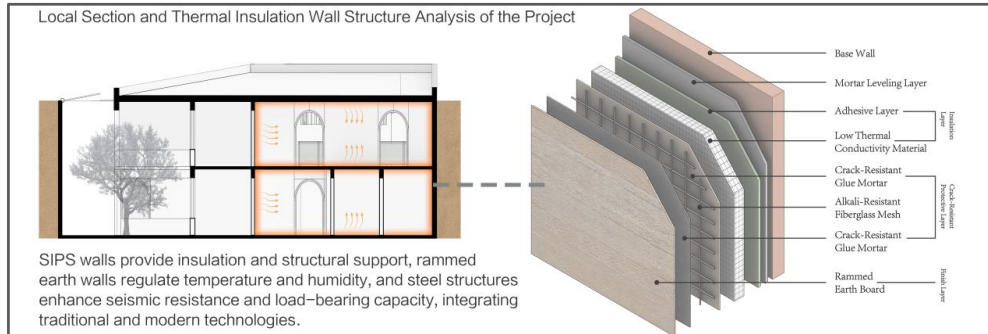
Application of SIPS Walls (Source: Hand-drawn)
